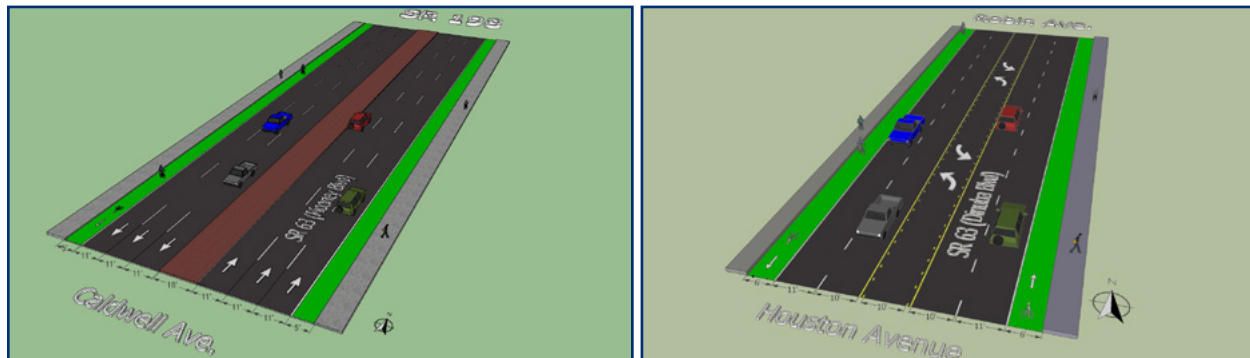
also shows proposed bike lanes for the 0.8-mile segment of N Dinuba Blvd from W Houston Avenue to W Robin Drive. In this road segment, travel lanes will be narrowed from 12 feet to 10 or 11 feet in order to provide 5-foot Class II bike lanes with green paint in conflict areas. The construction work is anticipated to start in spring of 2023.
